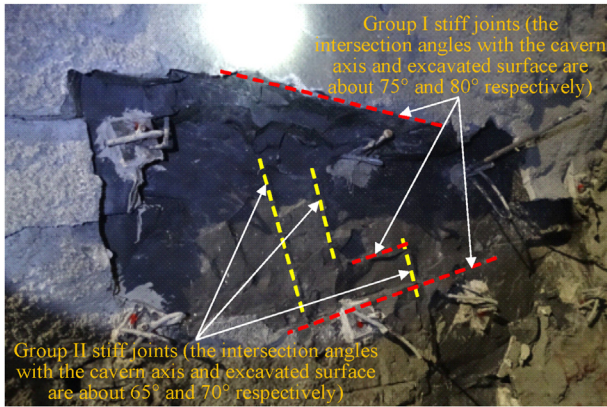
Influence of stiff joints on the rock spalling of the underground powerhouse at Baihetan hydropower station (Liu et al., 2017).
